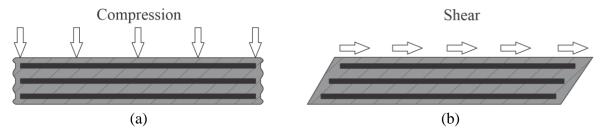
Bearing pads deformation modes: (a) Compression; (b) Shear
